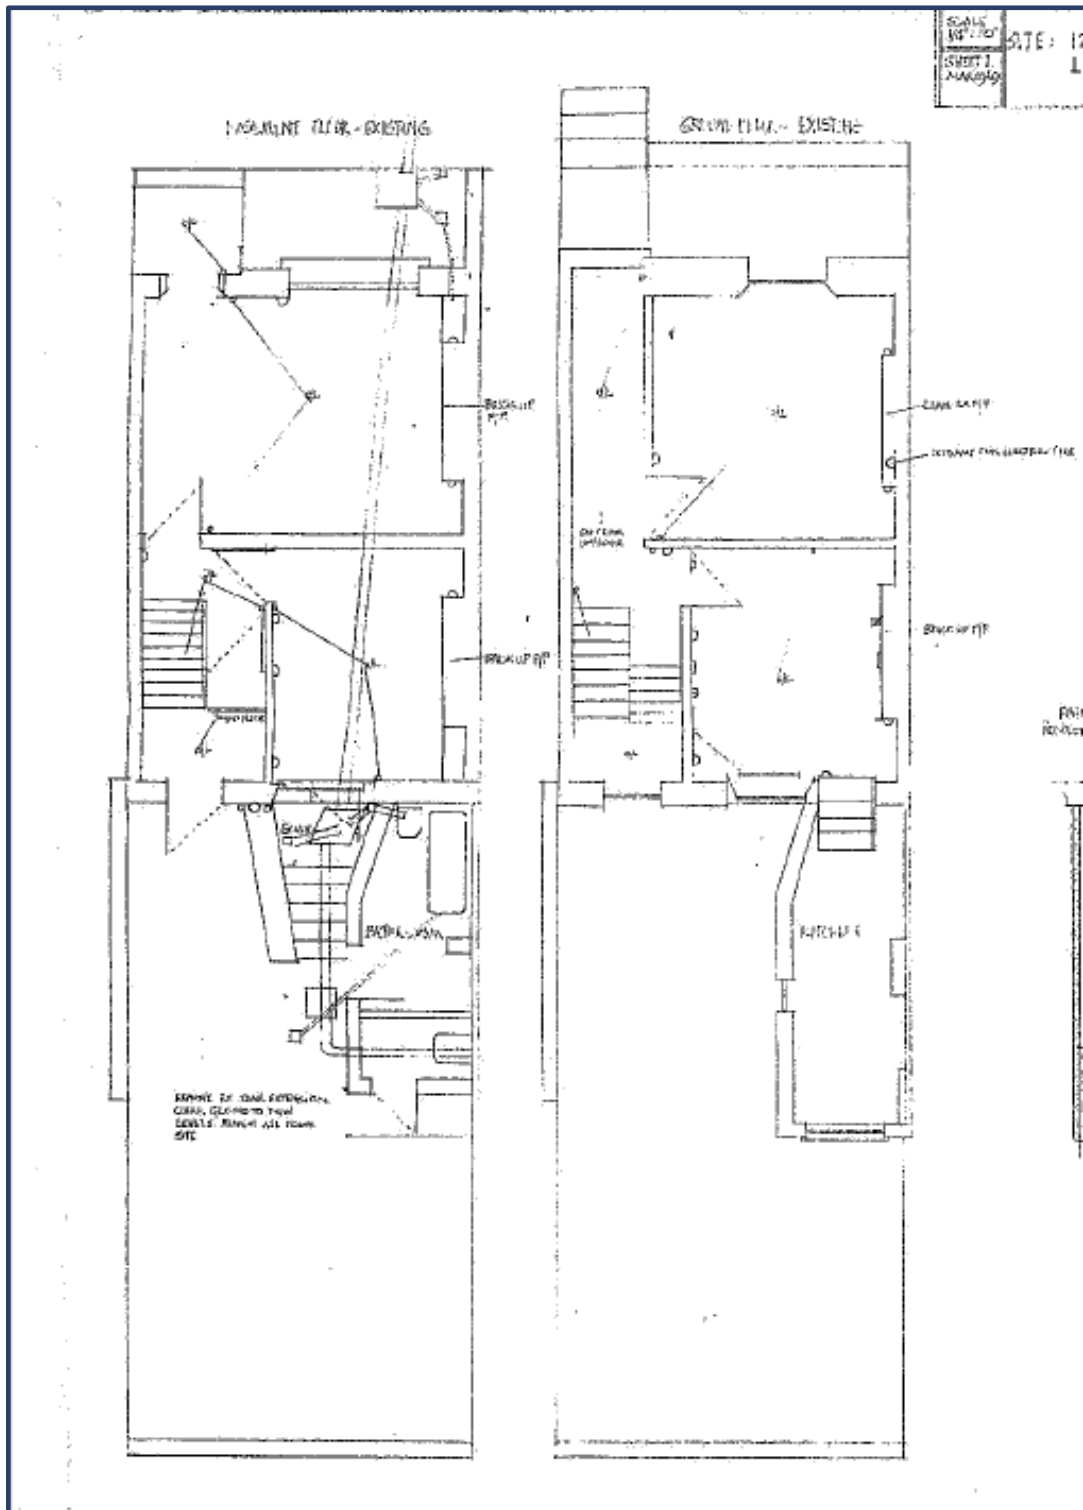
No. 124 Existing Architectural Plans (June 1969). Source: Camden Local Studies and Archive Centre.
